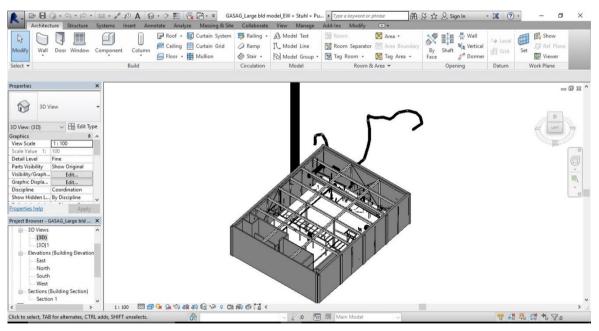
Autodesk Revit Model of Test Building (Source - HTW Berlin.)
